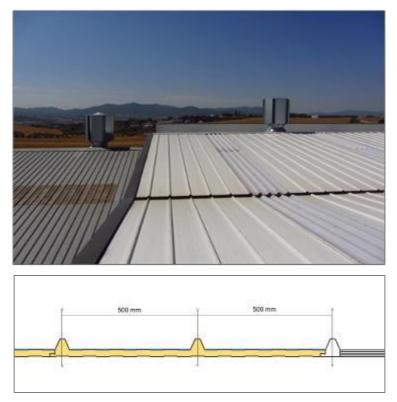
Standard sandwich-panel section currently installed in the CRICURSA roof
